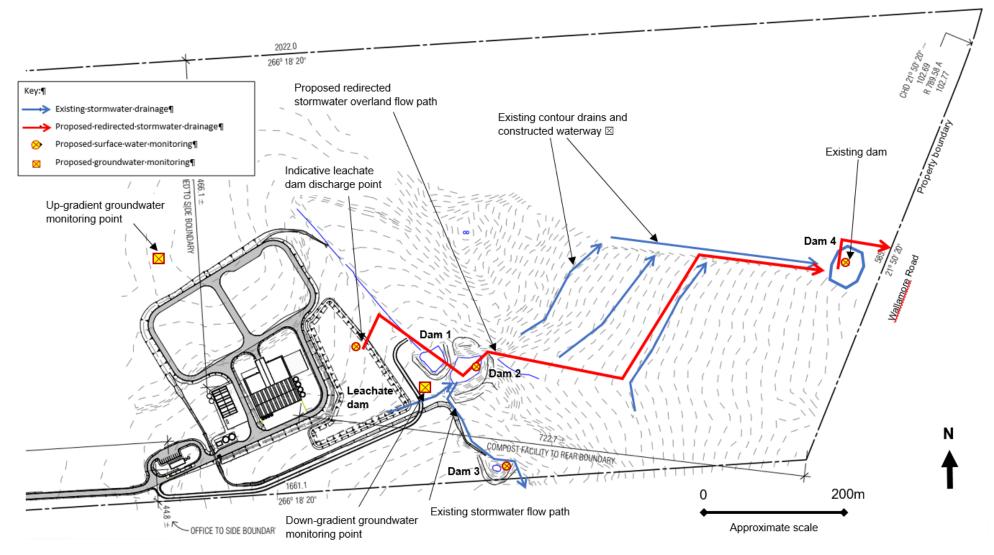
Plan showing existing and proposed redirected stormwater drainage paths, and proposed water monitoring locations
